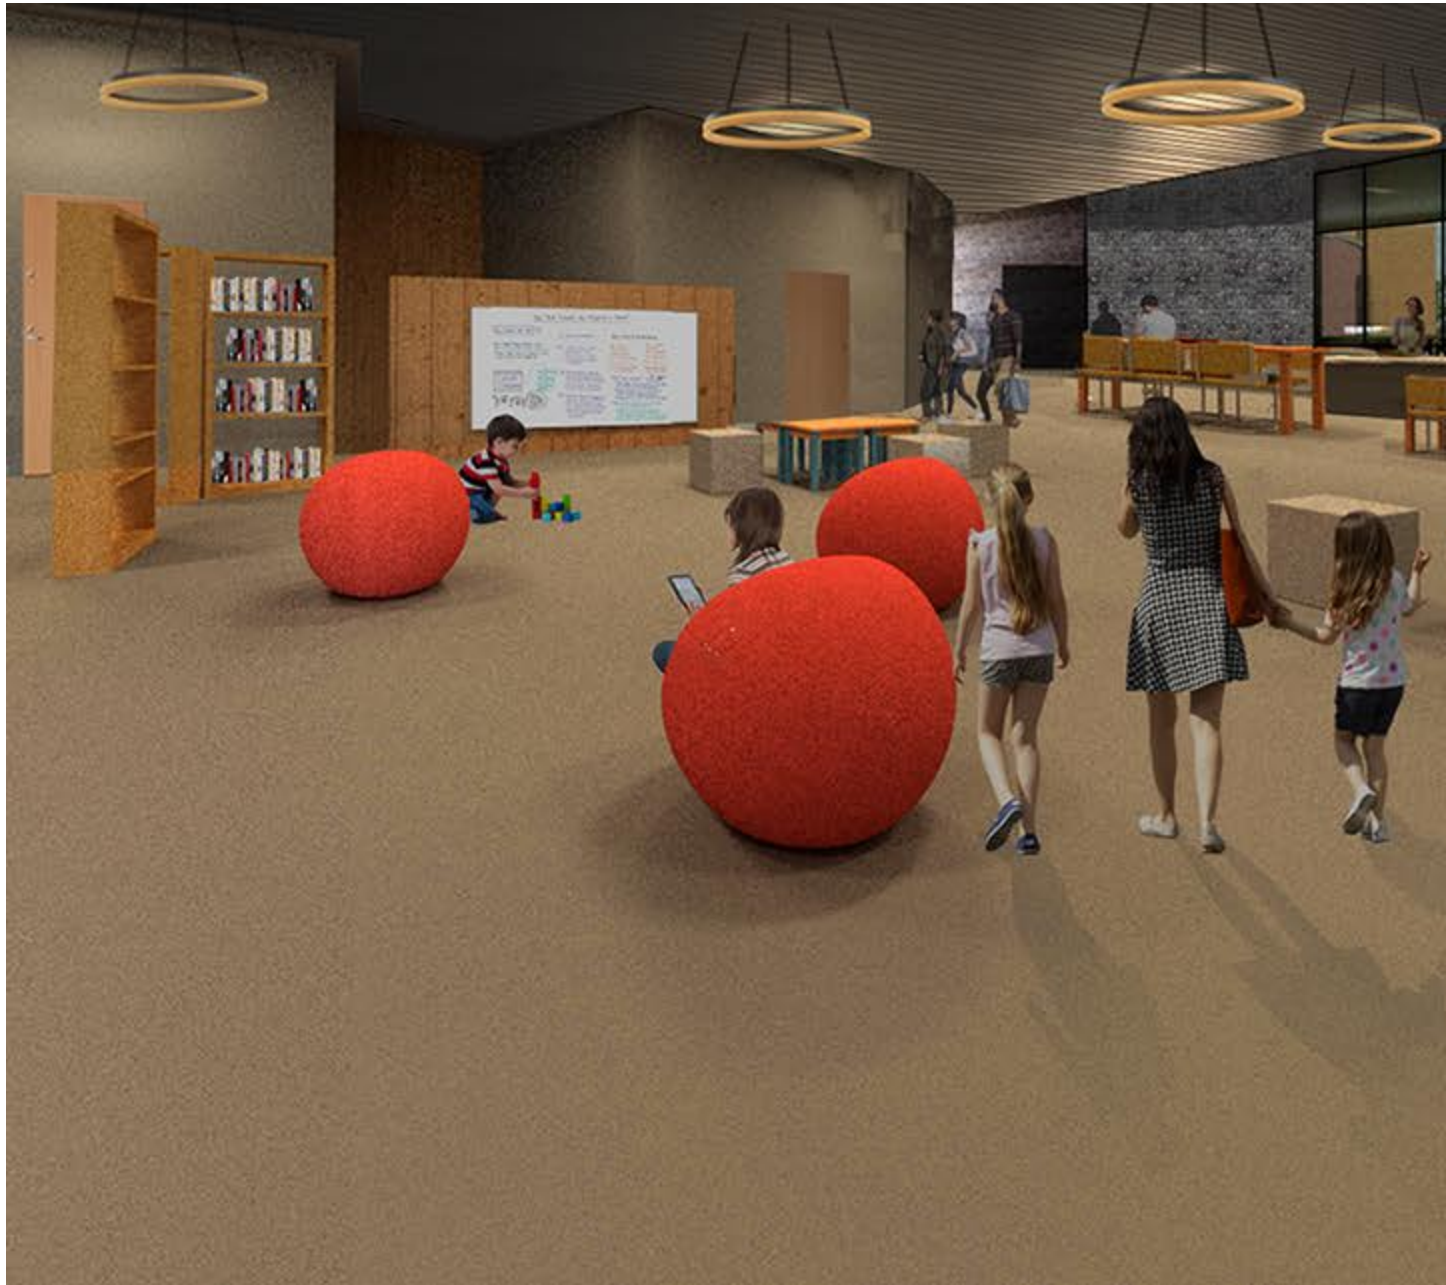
Interior render of communal space on the second floor of the renovated Northern Brewery complex.
